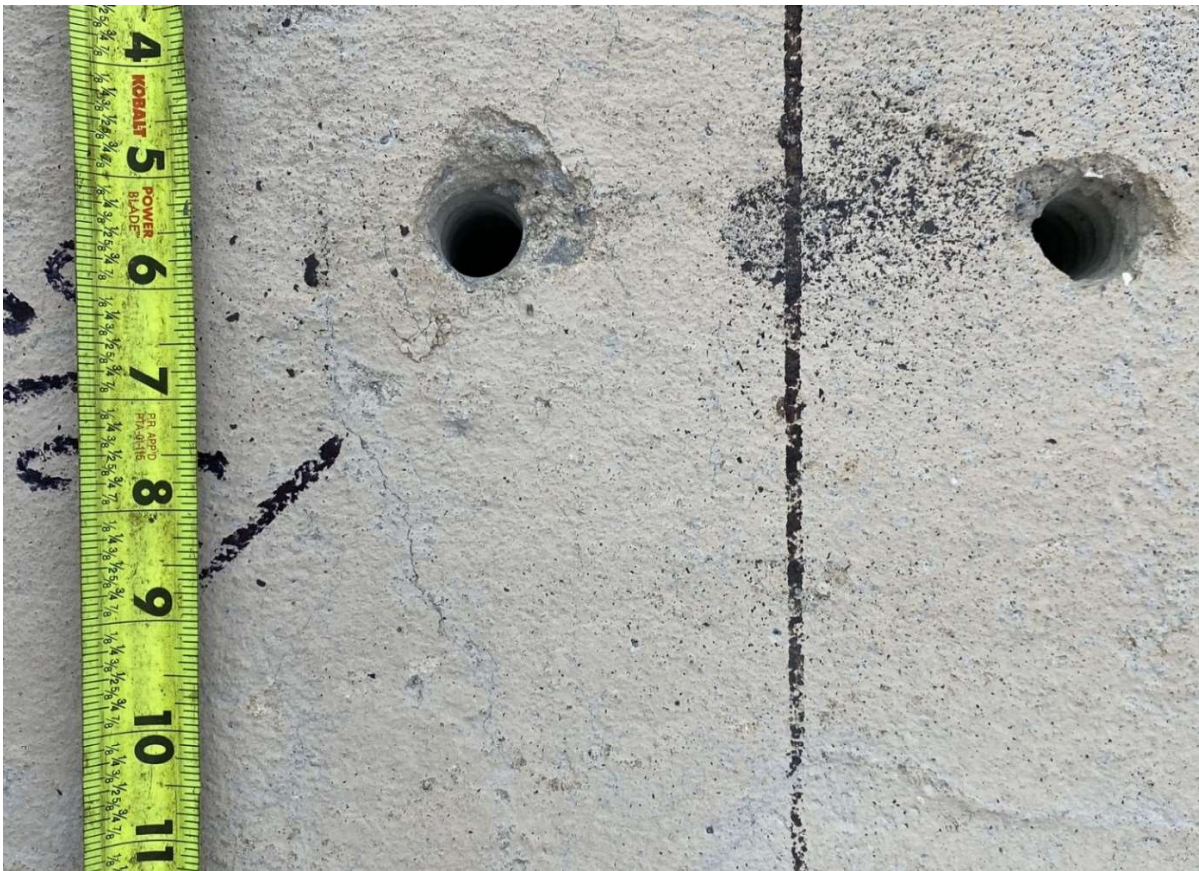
G-SSc-1 specimen concrete after cyclic loading
